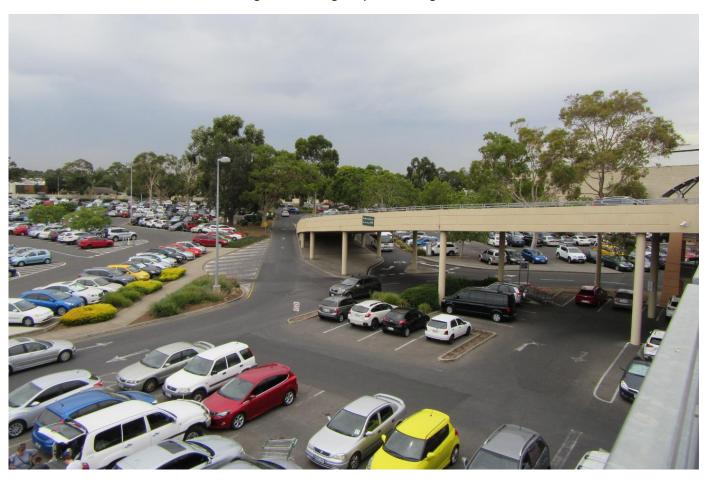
Existing car park and ramp looking north-east to Diagonal Road.
